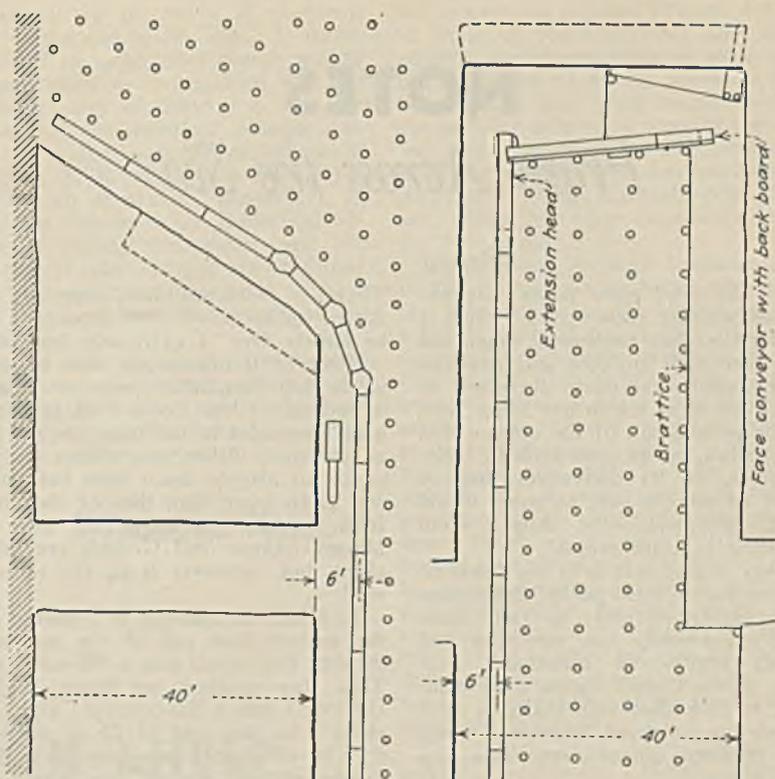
Left, method of mining pillars open-ended; right, details of room operation, showing how face conveyor is moved up with cutting machine
